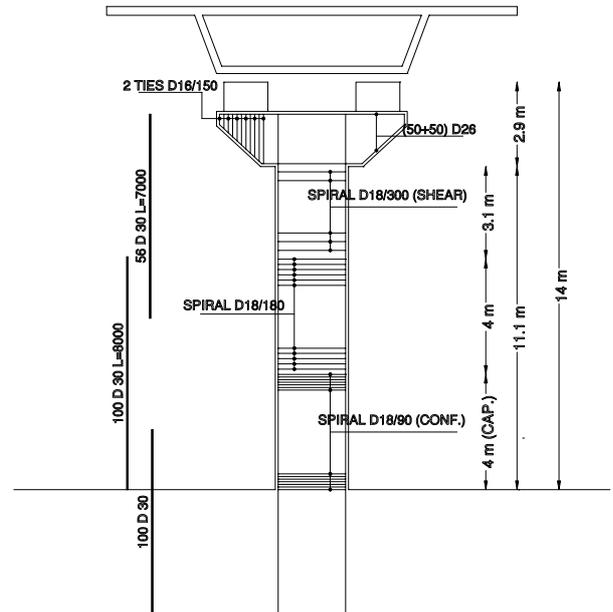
EC8 regular bridge lateral pier: rebars arrangement (mm)
